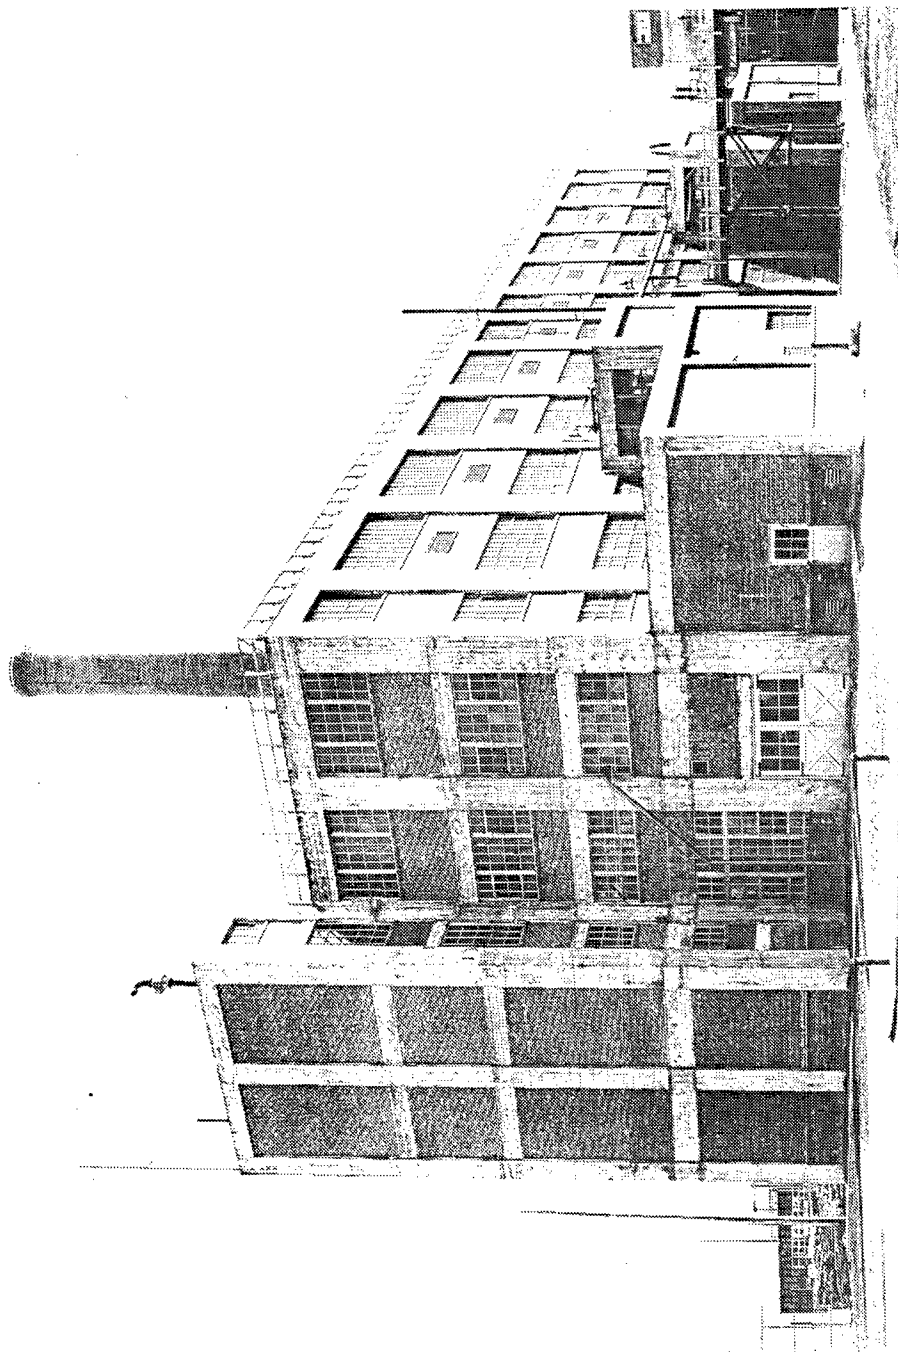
Anhydride Making, Building 20, Area A (courtesy of Holston AAP Photo Set No. 13 [on file Engineering Vault, Building 26]).
